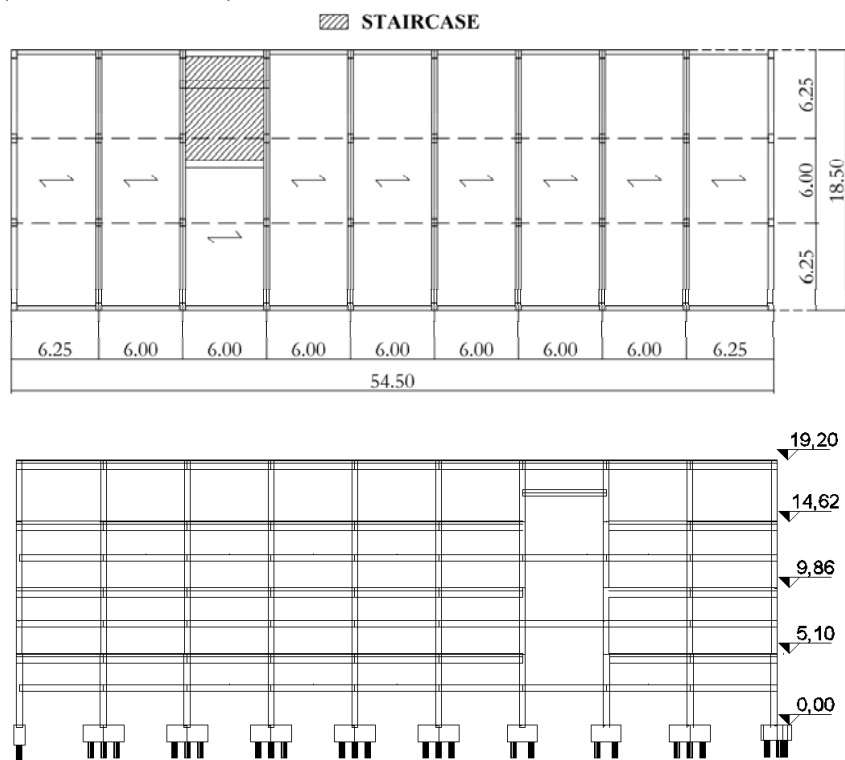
The plan and elevation views of the as-built existing RC building (dimesions are in meters)
